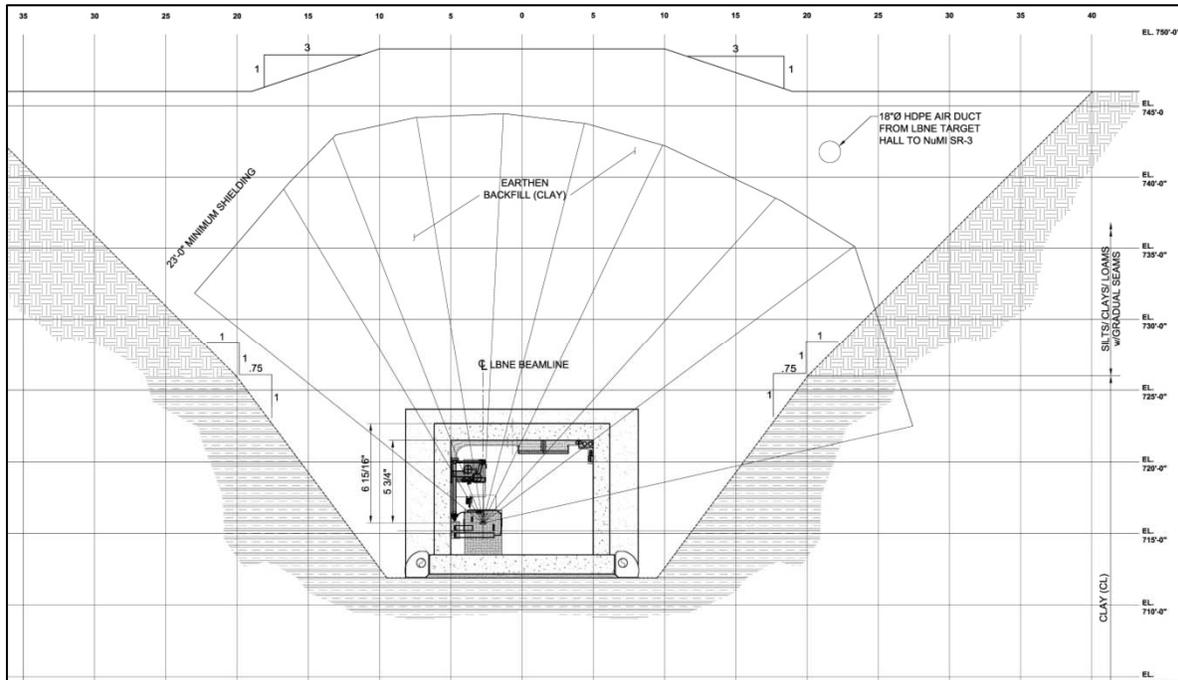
Primary Beam Enclosure Section View (Shown as Constructed in Open Cut Trench)
